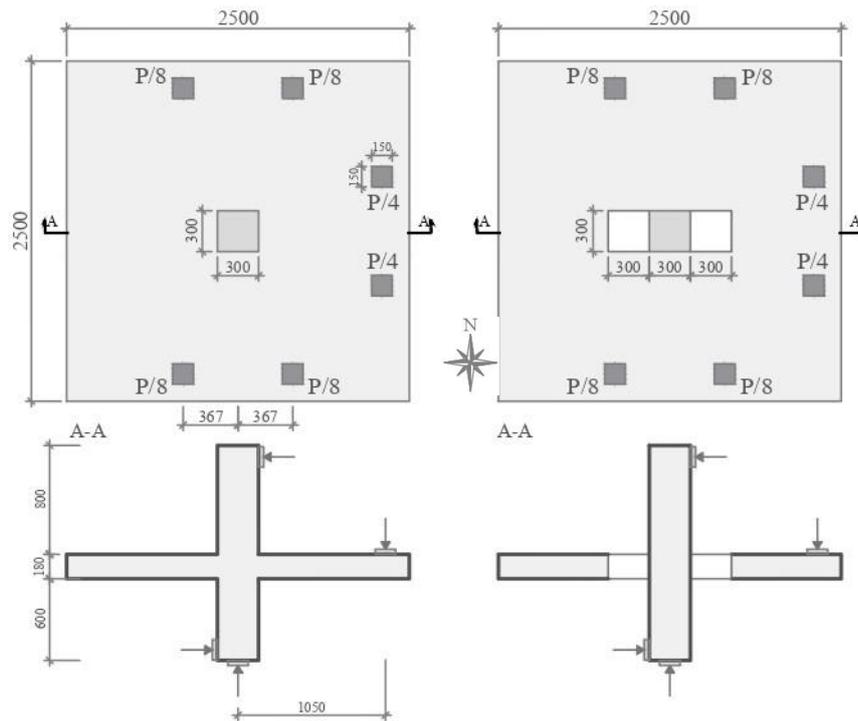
Main dimensions and load arrangement (Note: dimensions in mm)
